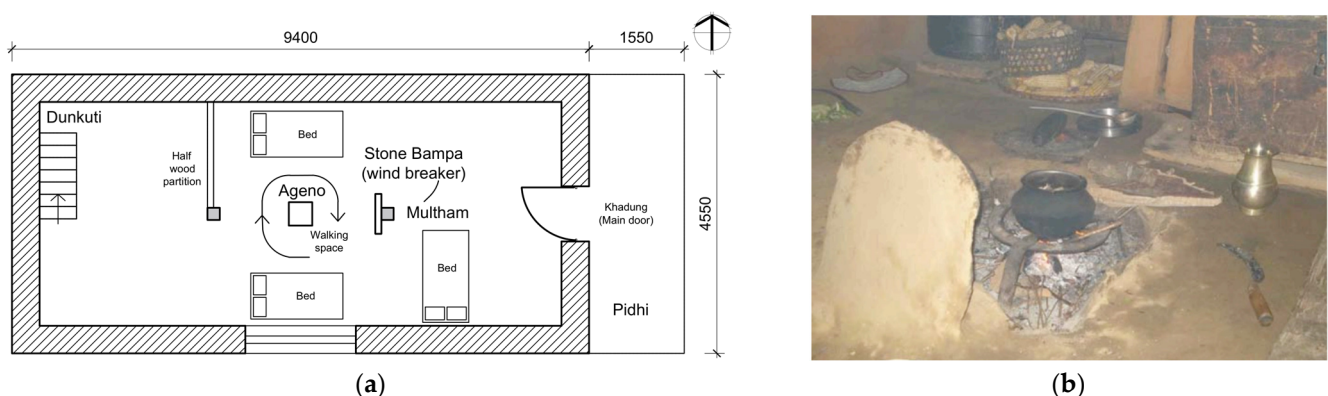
Traditional hearth with bampa: (a) ground-floor plan in the old vernacular house; (b) bampa in a vernacular Thami house (Source: Tek Bahadur Thami, as cited in [69]).
